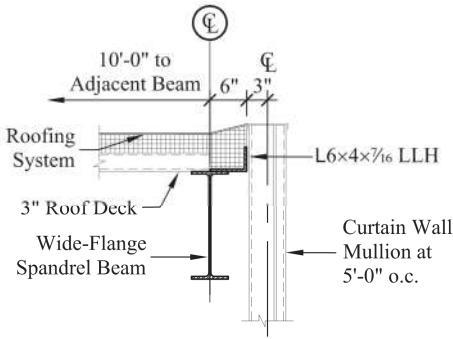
Section of roof spandrel beam with eccentric curtain wall load.
